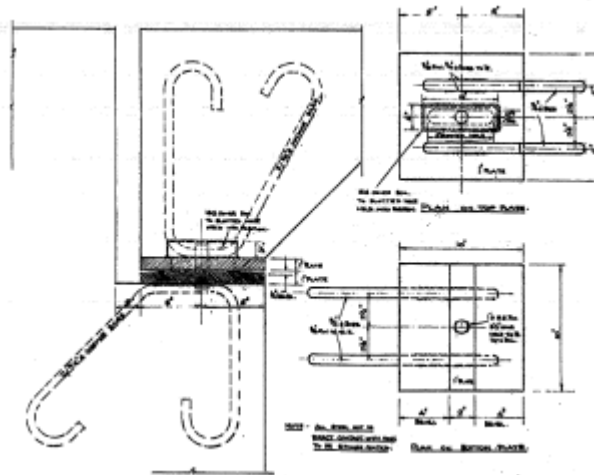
Connection Details – Link Structure to Galbraith Building
